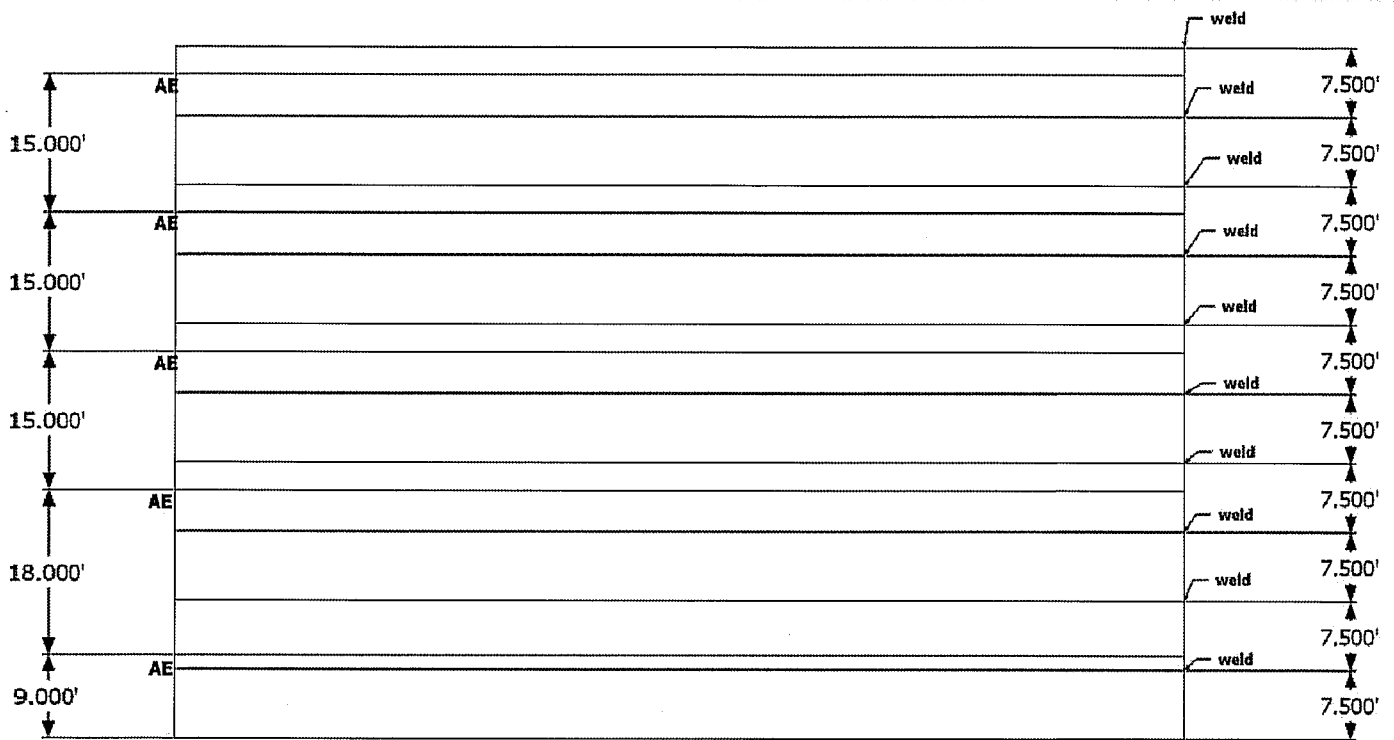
AE Sensor Layout and circumferential weld elevations
